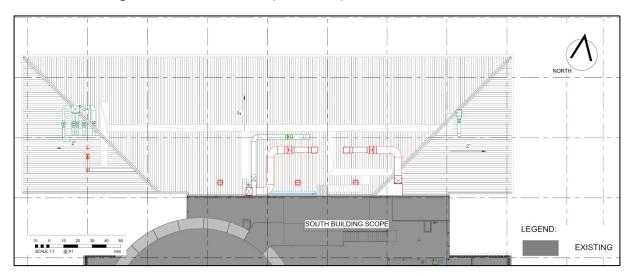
| SSD-8963 Approved roof plan (Base source: SSD-8963)
